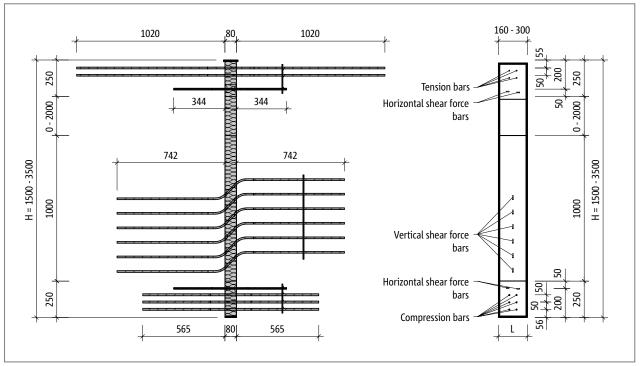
Schöck Isokorb® T type W-M4: Poduct section and layout
